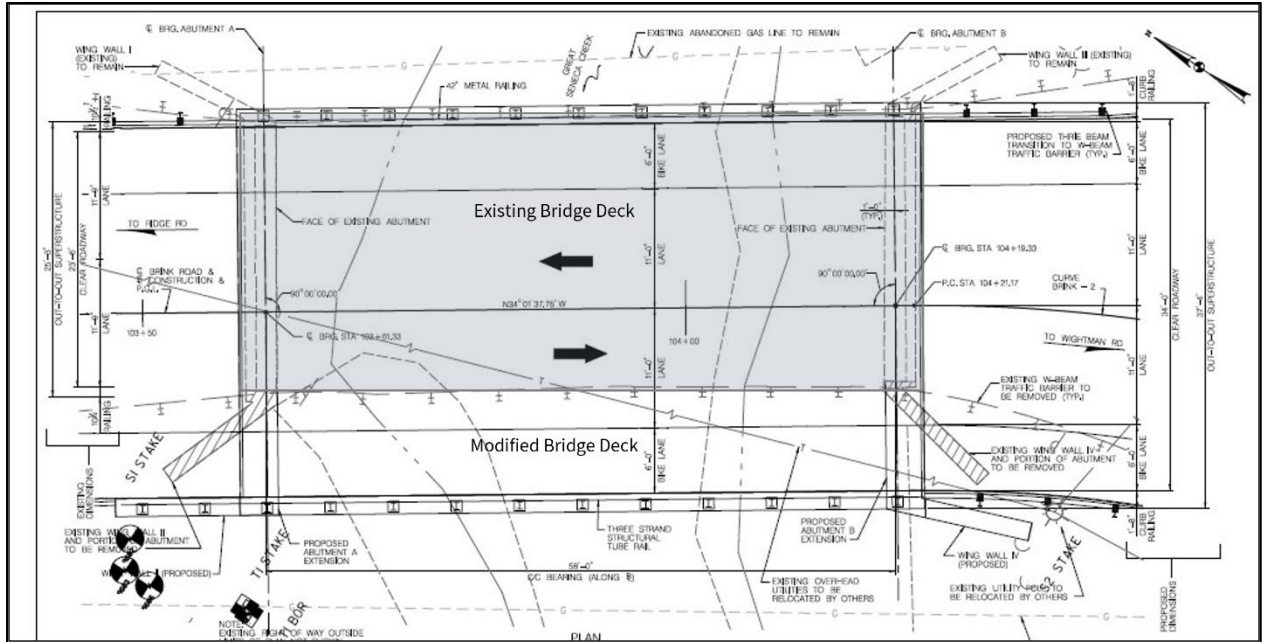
Brink Road Plan View Existing versus Modified Bridge Deck
